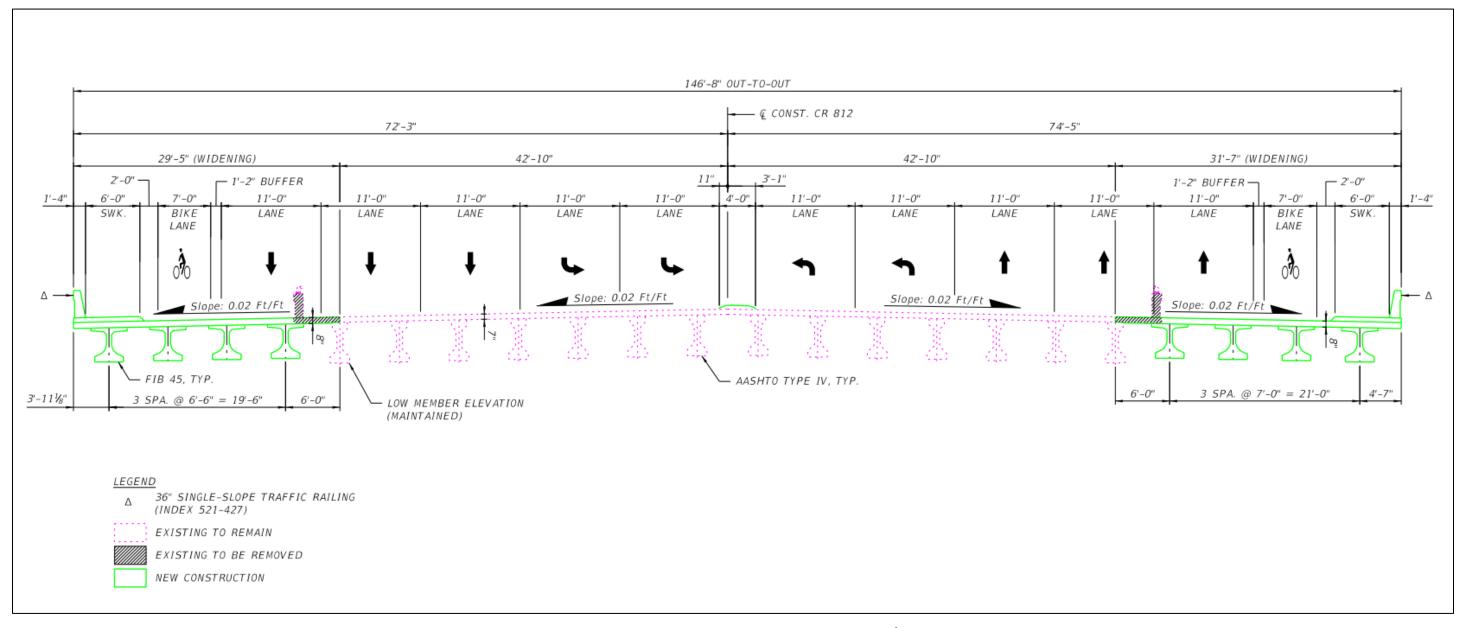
Build Alternative 1: Bridge Over SFRC Railroad and SR 9/I-95 - Typical Section
